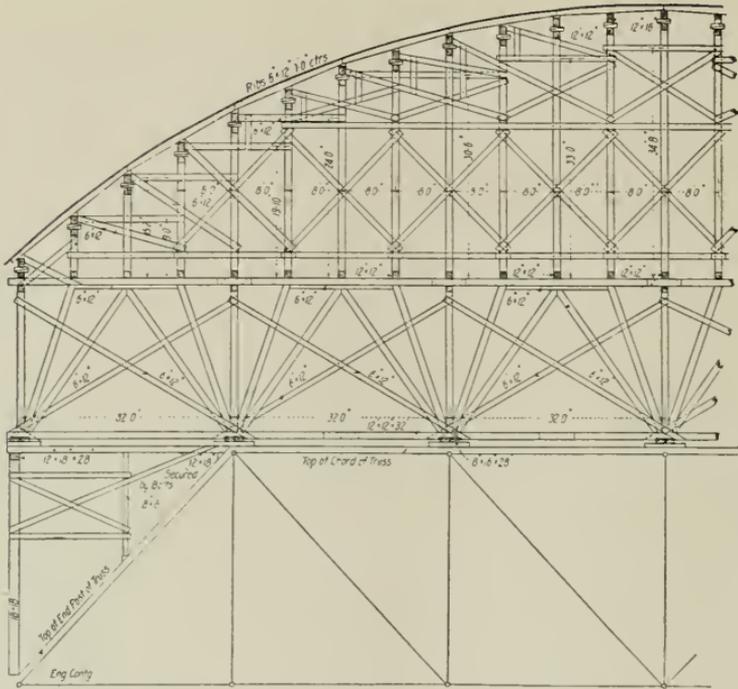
Details of Timber Center for 281-Foot Concrete Arch, Spokane, Washington
